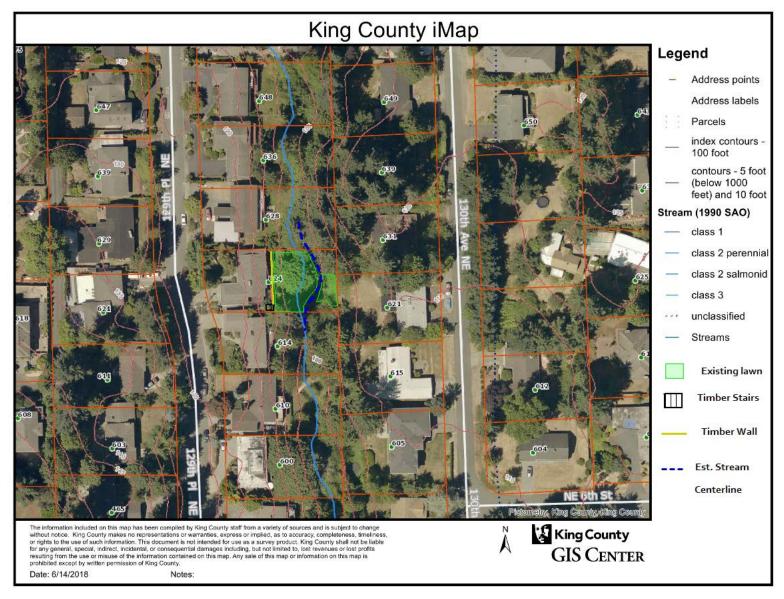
Backyard Plan View Prior to Replacement of Stairs and Retaining Wall
